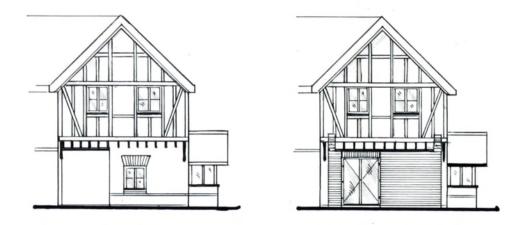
Existing and proposed elevations (north-west) – 2023 scheme
